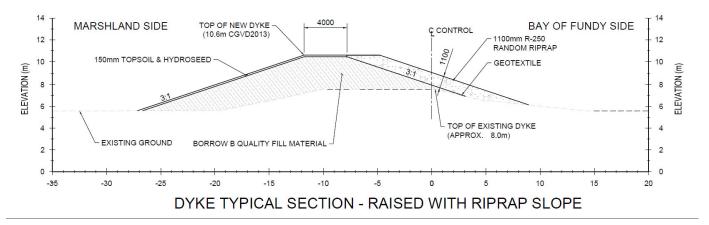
Dyke Typical Section for Raising Existing, Options A and C
